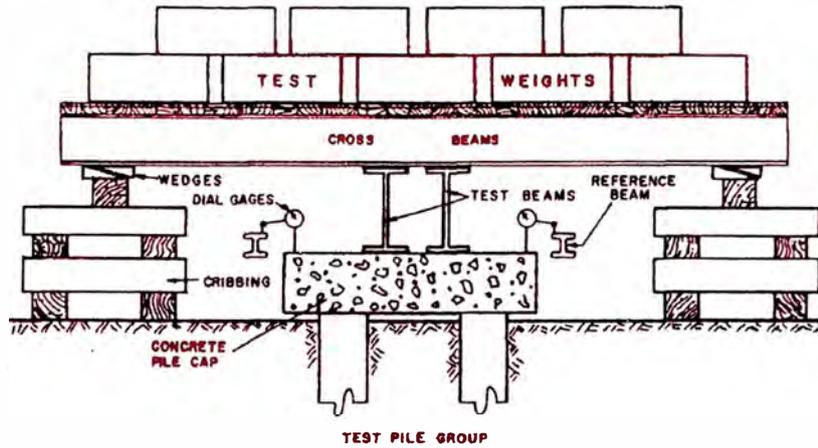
Possible Arrangement for Applying Load Test to Pile Group Using Weighted Platform
